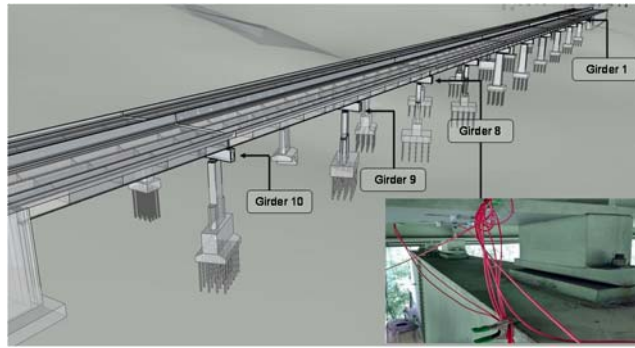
RC Deck-on-Steel Girders Viaduct geometry
